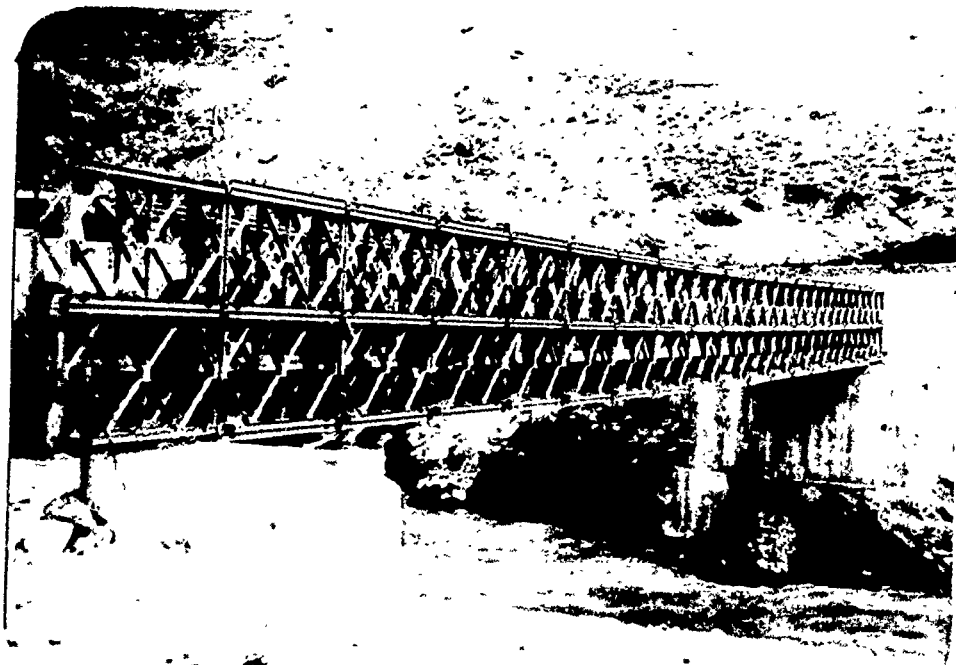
Another view of upstream of the structure looking from left abutment to right abutment
